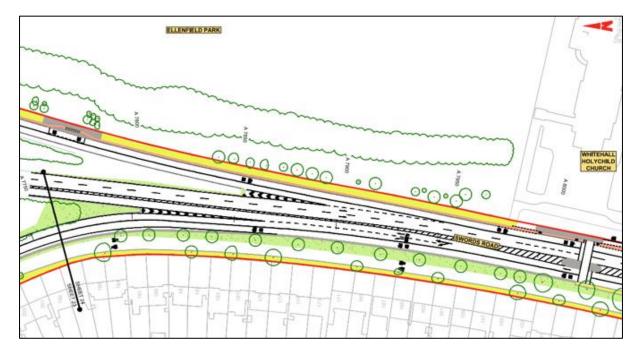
Proposed Landscape General Arrangement at the Slip Road (Sheet 24)
